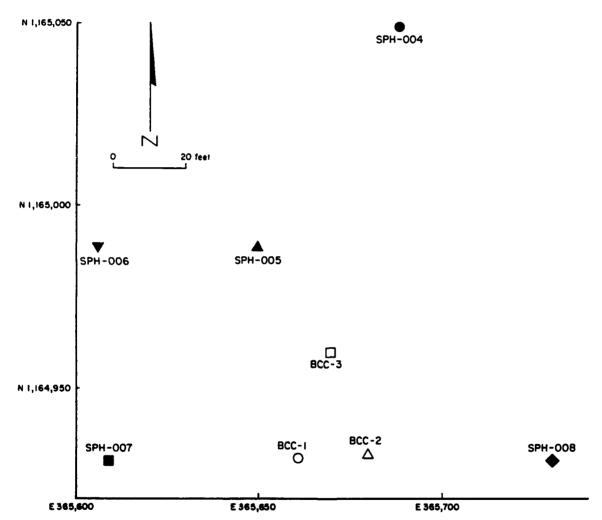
Plan View of Sector H Test Site at Jackson Lake Dam
